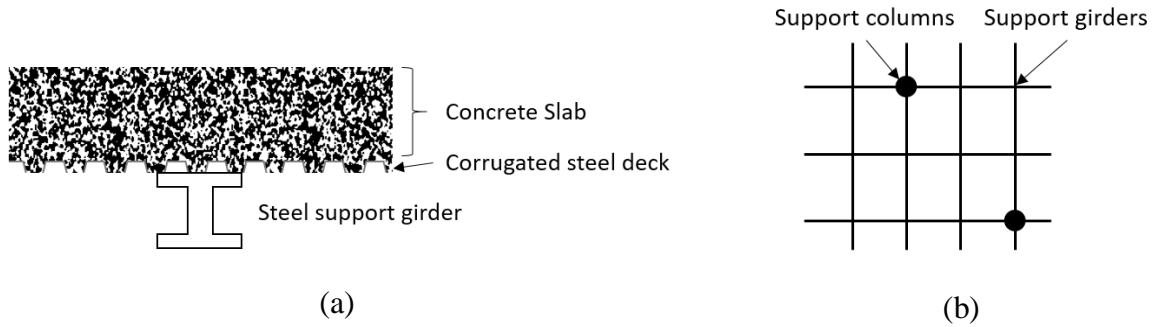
A sketch of the layup for a typical composite steel floor (a), and an example of a floor section as seen from above (b), over which concrete is poured.
